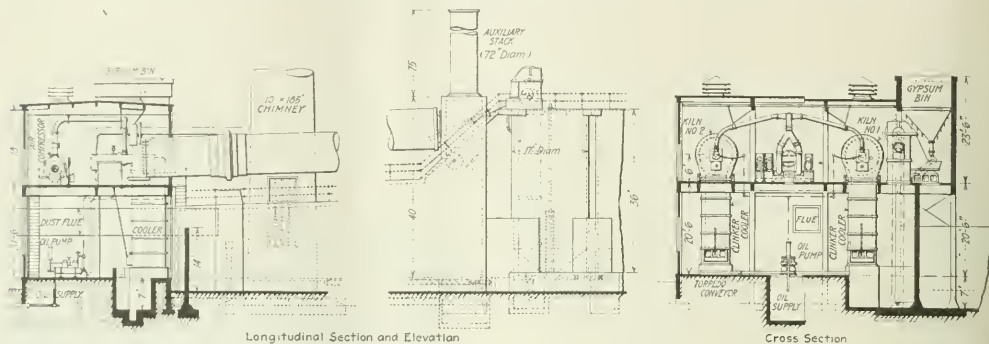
GENERAL LAYOUT OF KILN BUILDING
